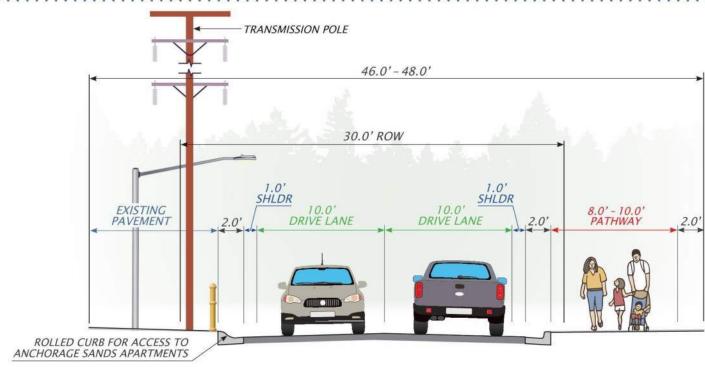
Alternative 3 W. 32<sup>nd</sup> Avenue typical cross sections
